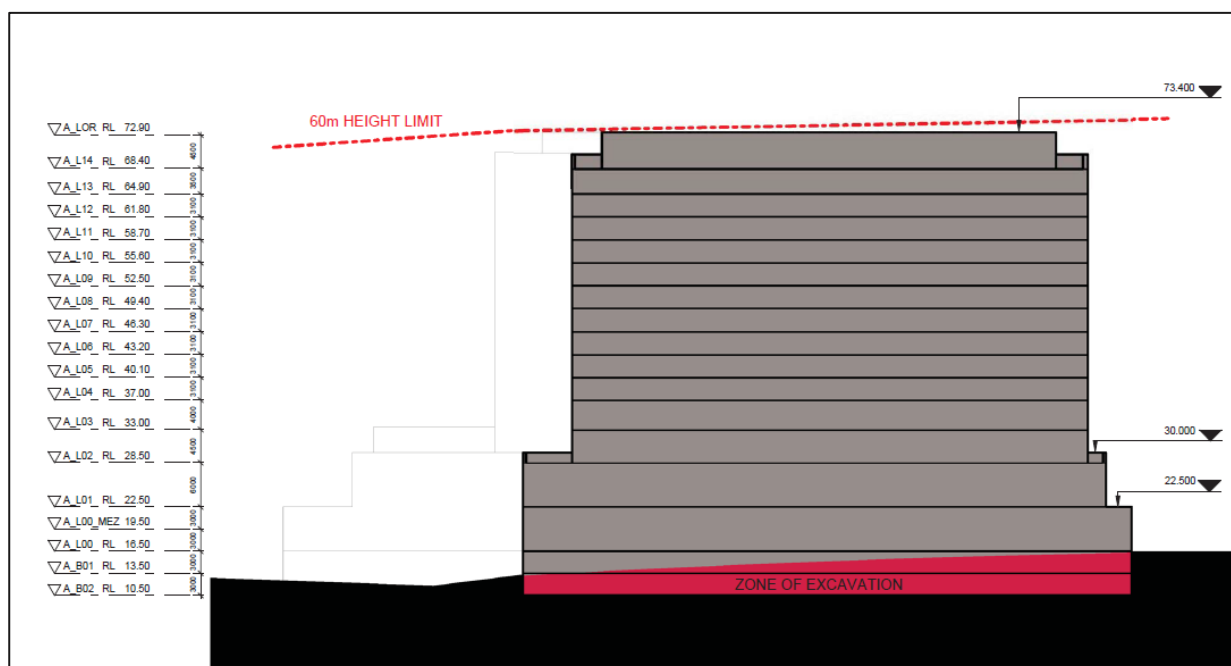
Above Ground Car Park Envelope – Southern Elevation
